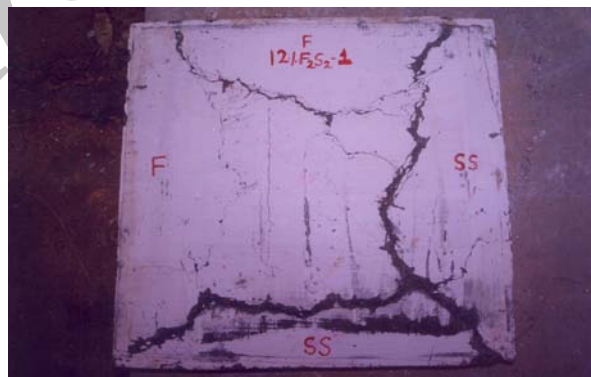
Failed specimen depicting crack pattern of SIFCON-12% fibre volume slab
